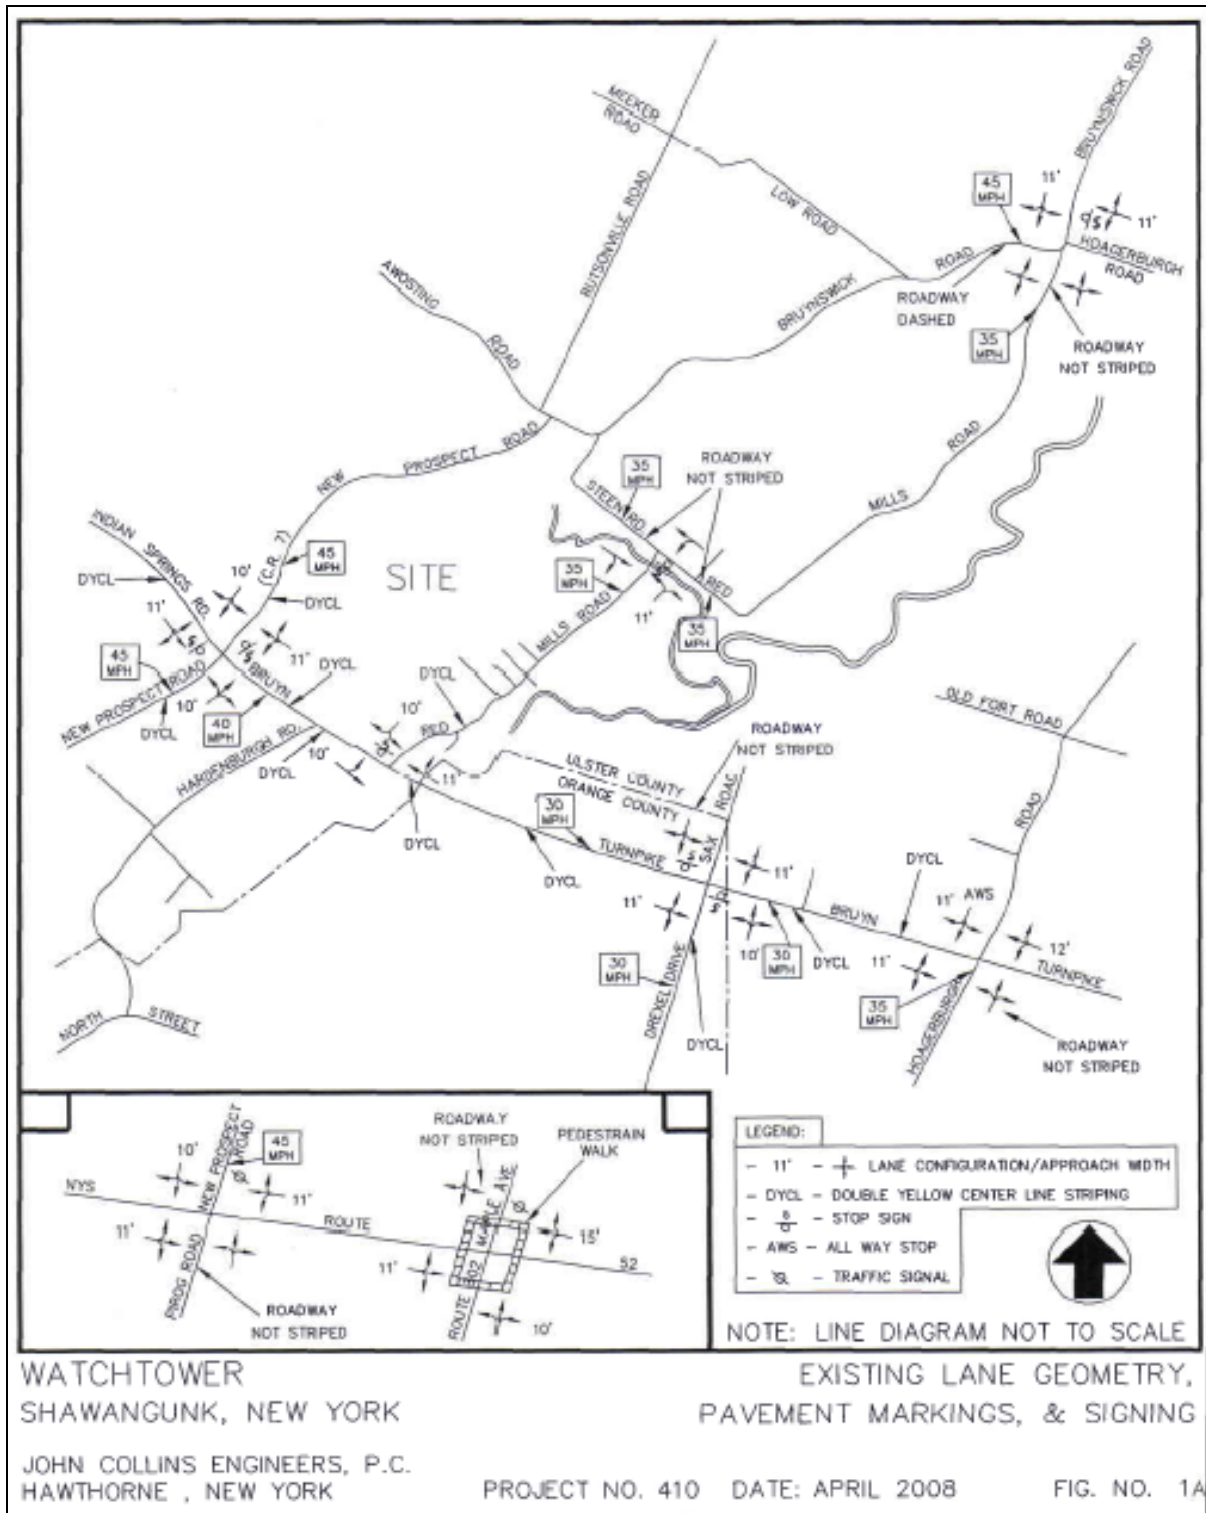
Existing Lane Geometry, Pavement Markings, and Signing
